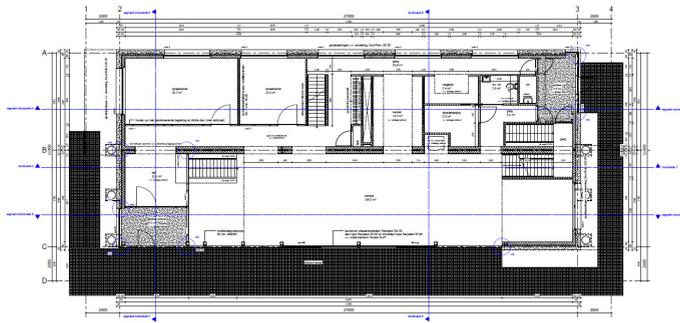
Water-level plan, with offices and facilities (courtesy of Attika Architecten, Amsterdam, The Netherlands).
